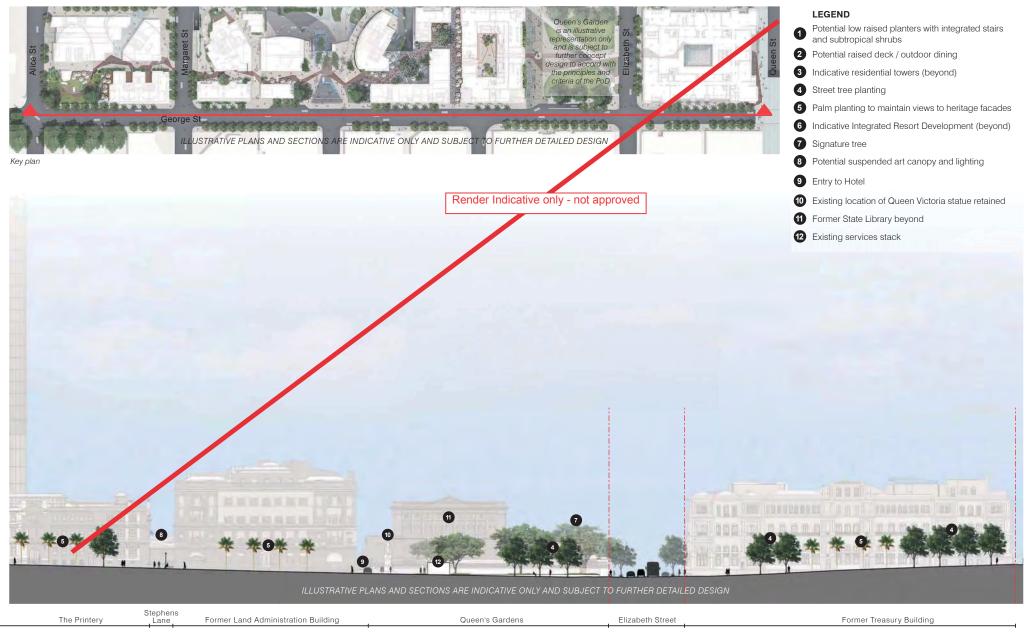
George Street - South Sectional Elevation (Not to scale)
